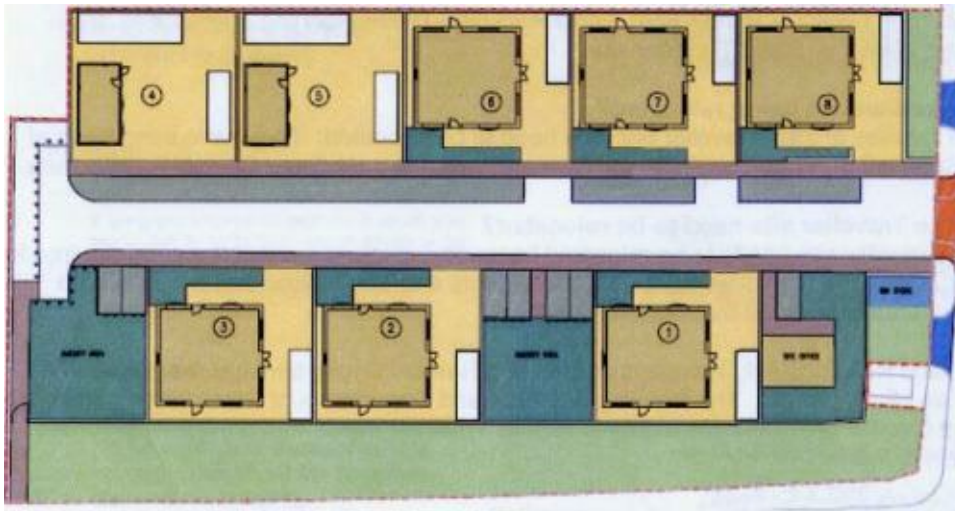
Image above, site plan with drive, dayrooms and caravan parking spaces (Hackney Council, 2009)
